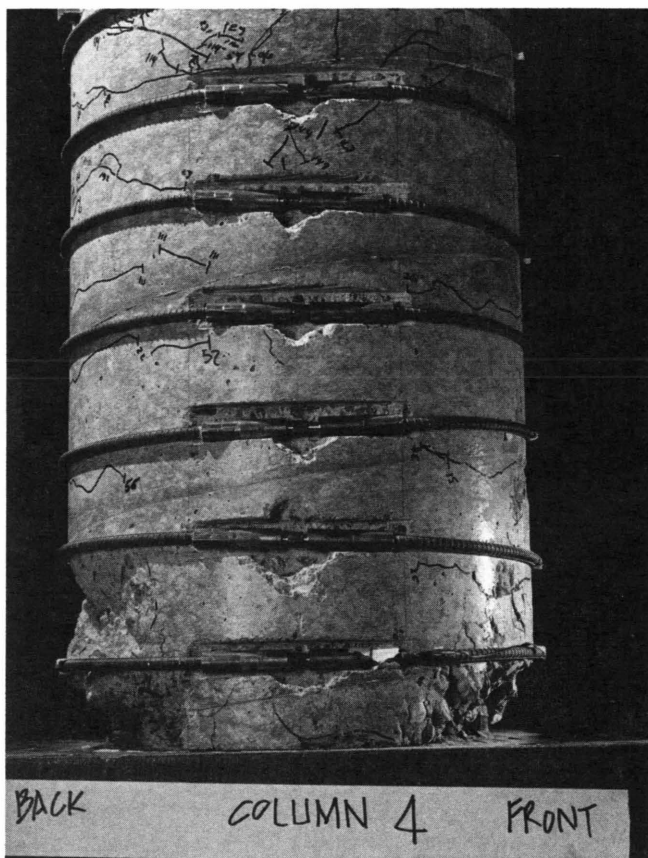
Column 4 elevation at completion of test: this column had minimum external confinement; concrete crushing developed above bottom hoop.
